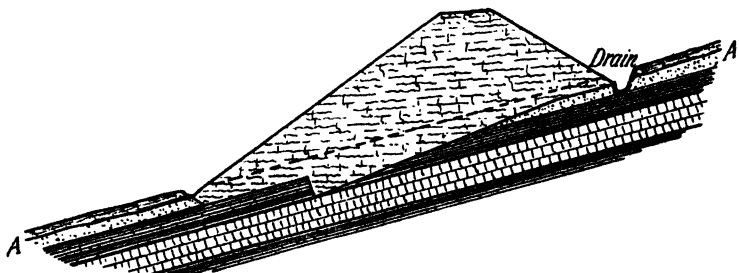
Embankment on Soft Overlying Ground, Stabilised.
